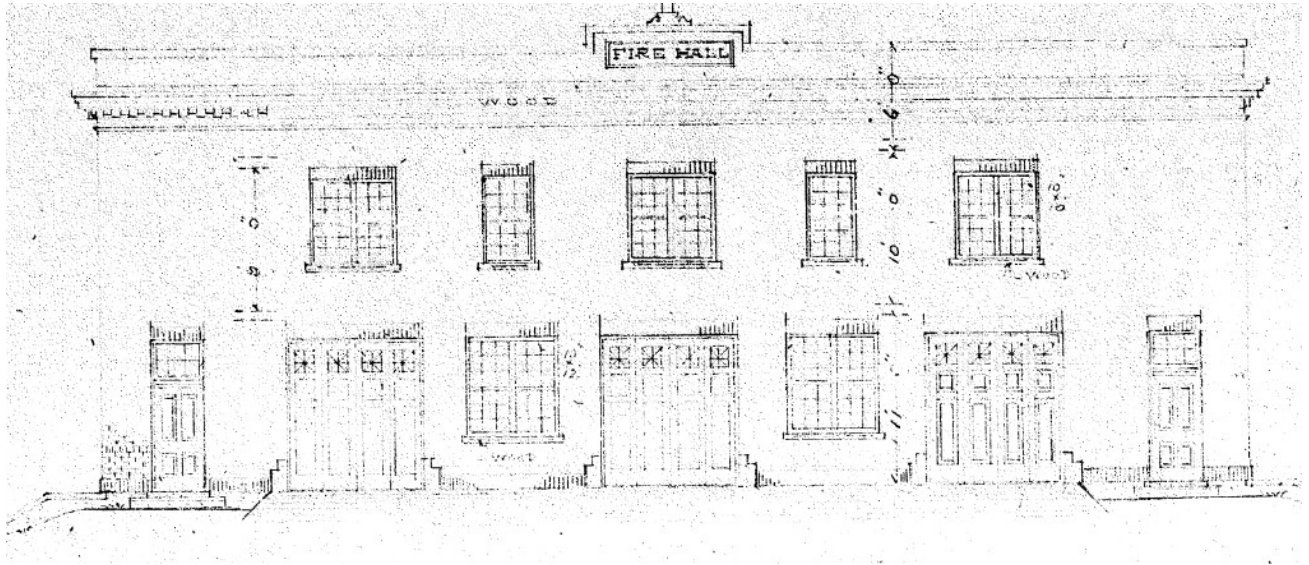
Original (circa 1928) bay door configuration on east elevation from circa 1928 drawings
